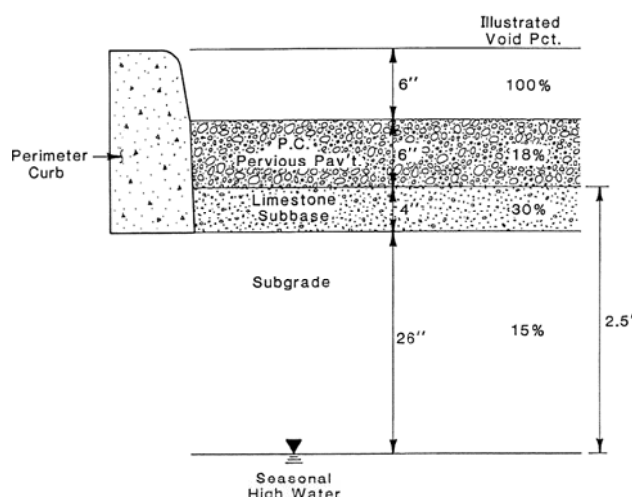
Schematic of pervious concrete pavement designed as stormwater retention system (1 in. = 25.4 mm).
